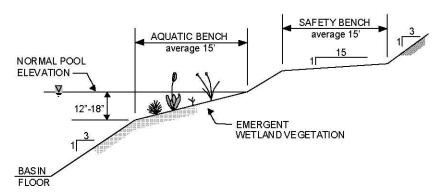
Typical Stormwater Pond Geometry Criteria
